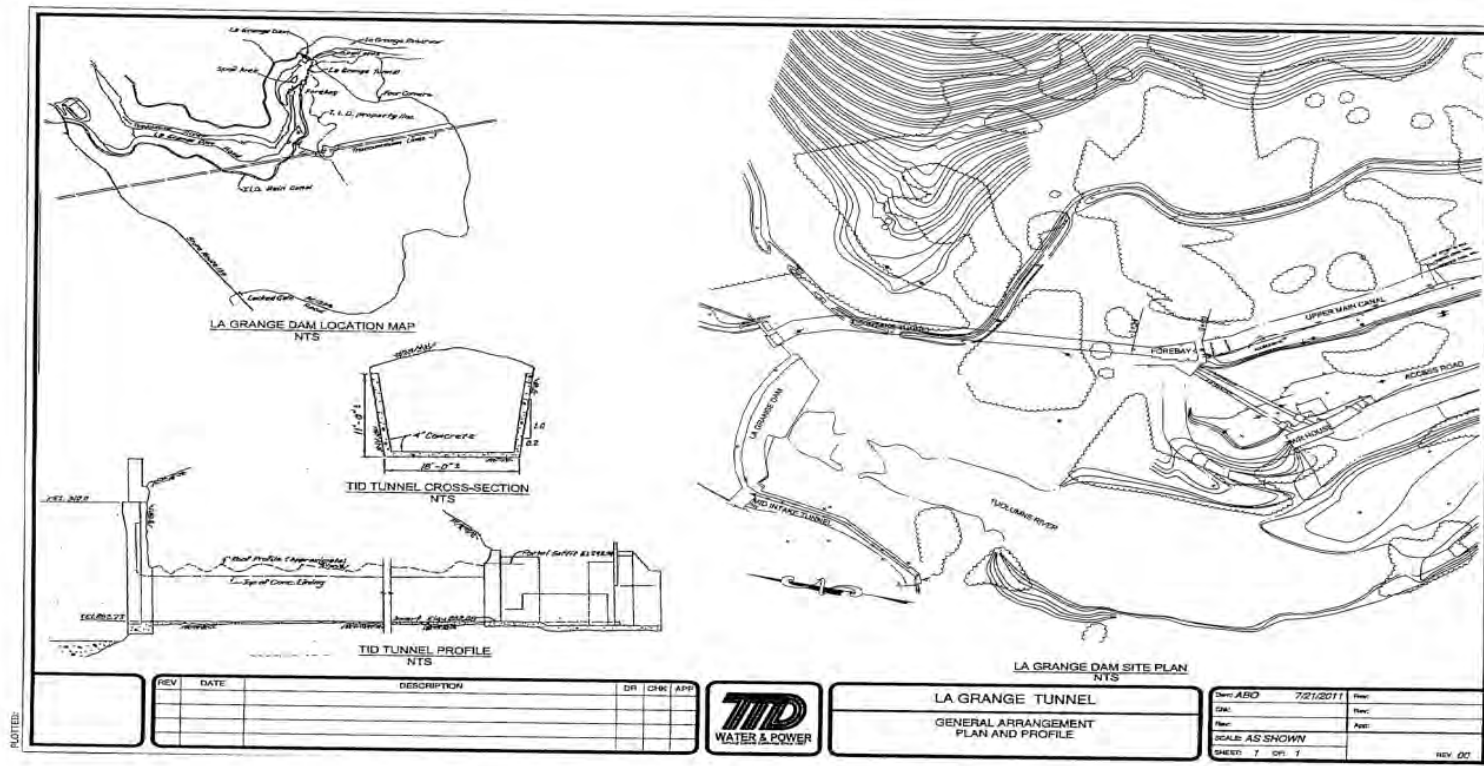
Site plan of La Grange diversion dam and facilities showing diversion dam, TID tunnel intake, tunnel location, penstocks, powerhouse, and Upper Main Canal.
